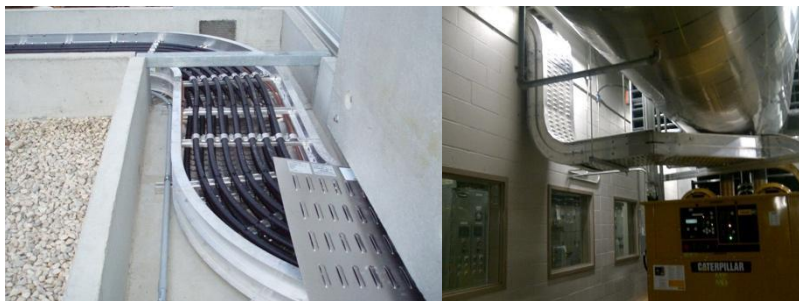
Cablebus installed outdoors (left) and indoors (right)
